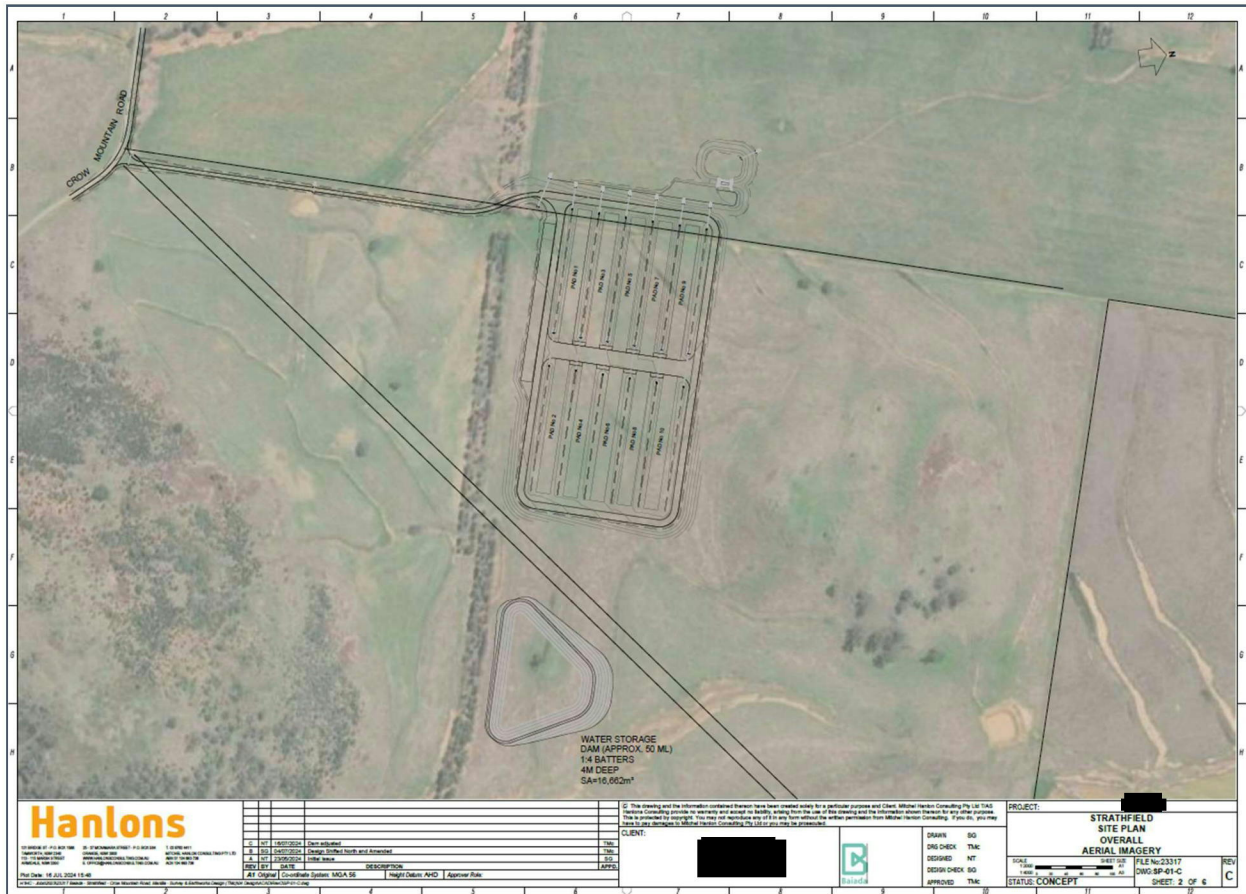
Modified Farm 4 Layout Plan (Hanlons, 2024)
